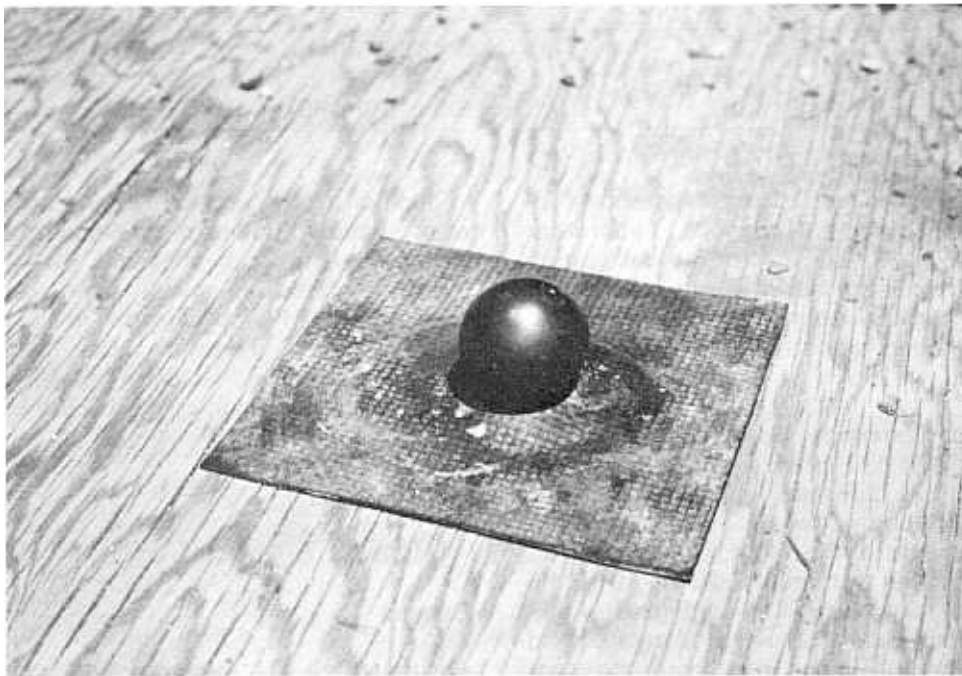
Test specimen after Mullen hydrostatic testing. Delamination of lining has occurred due to aggregate point stressing. Photo P-801-D-79754
